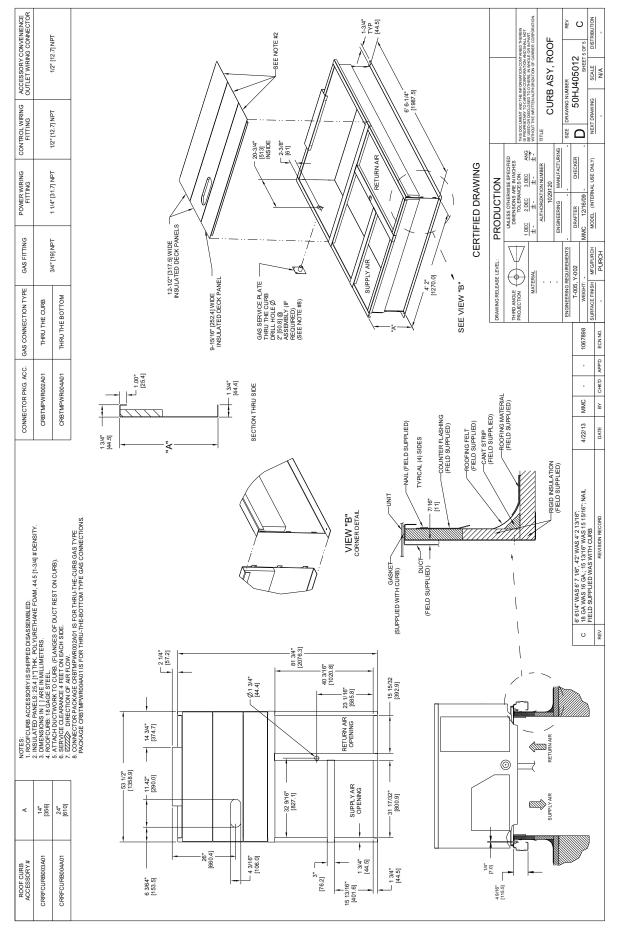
48FC\*\*08-14 Roof Curb Details
